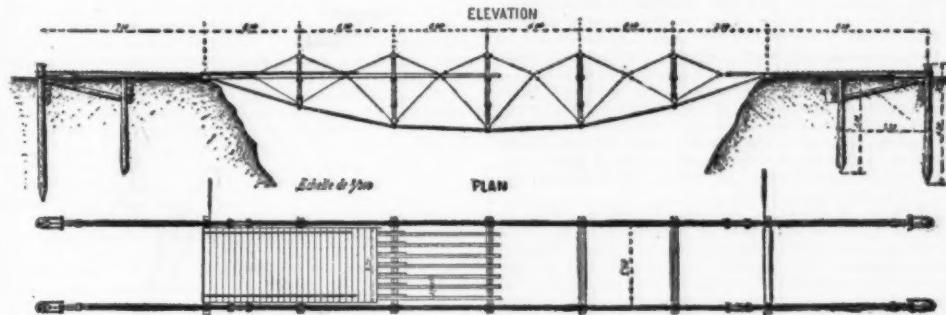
ELEVATION AND PLAN OF THE GISCLARD BRIDGE.
